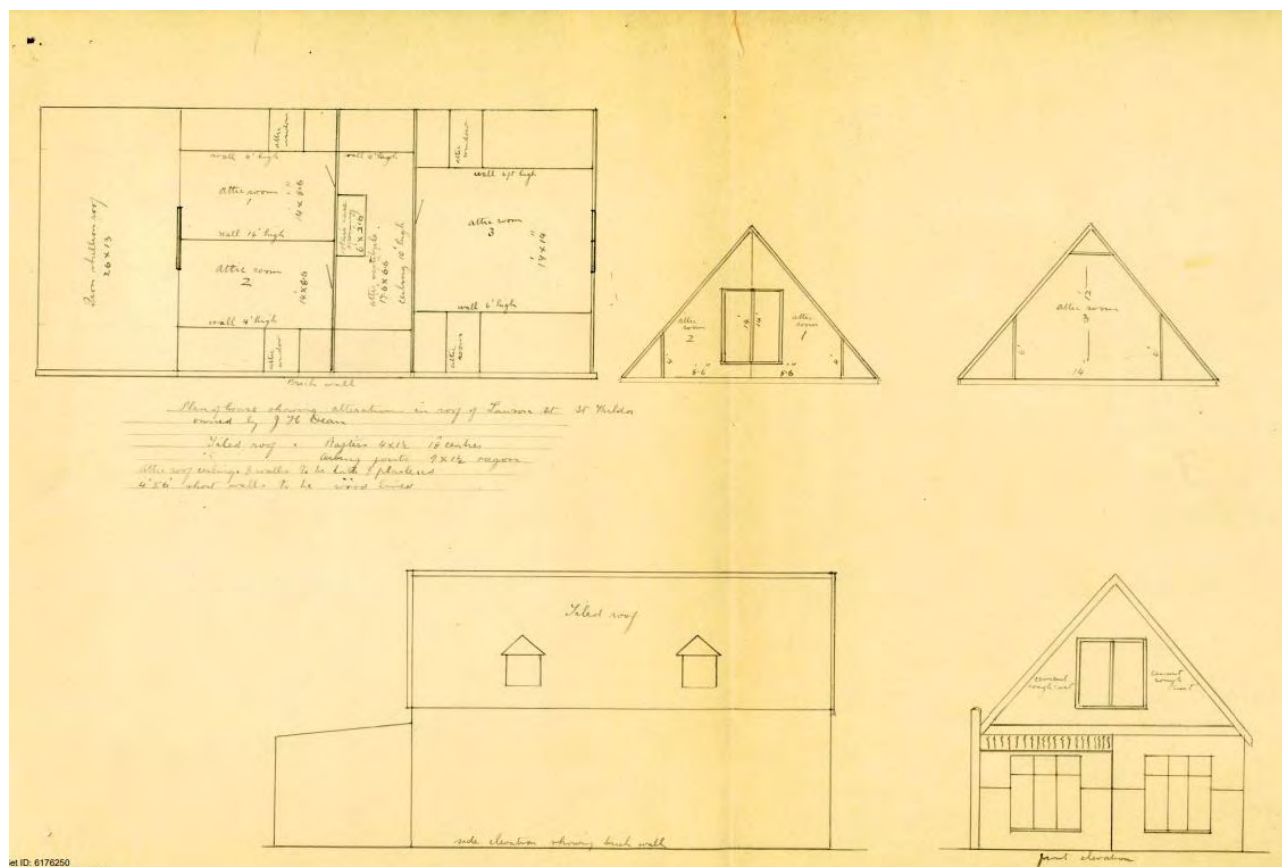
Plans, sections and elevations showing alterations to roof. Source: J. H. Dean. n.d. Drawings of 7 Lawson Street, Elwood. Council Records. City of Port Phillip.
